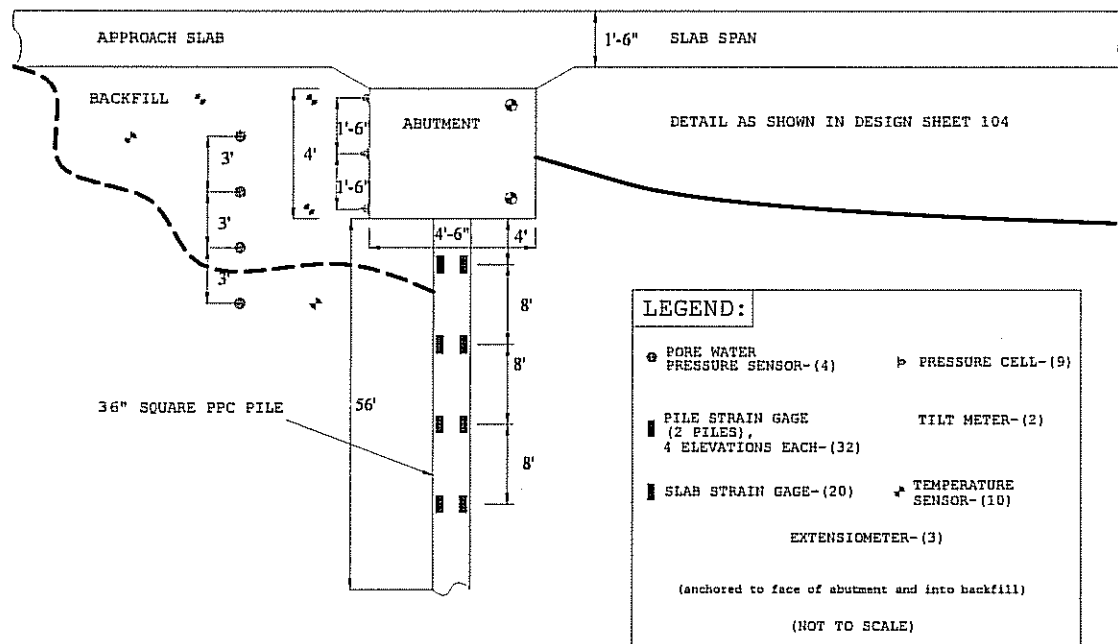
Instrumentation Plan for Caminada Bay Bridge –Substructure
